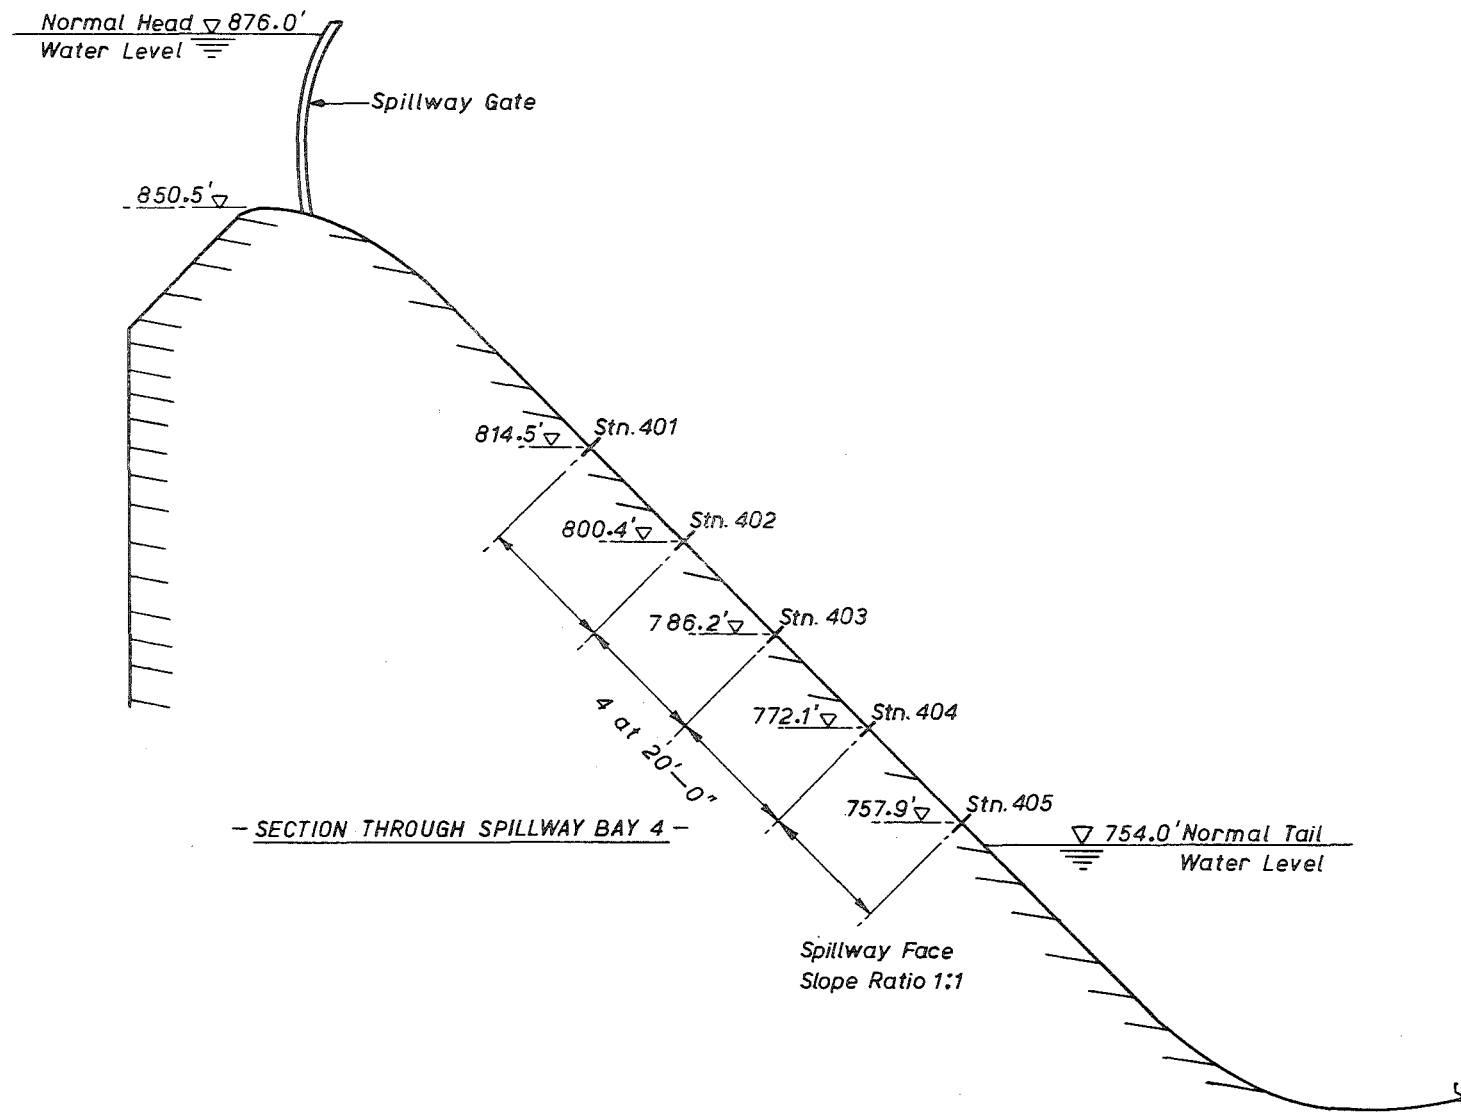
LOCATION OF FIELD TEST UNIT ANCHORAGE STATIONS ON SPILLWAY
